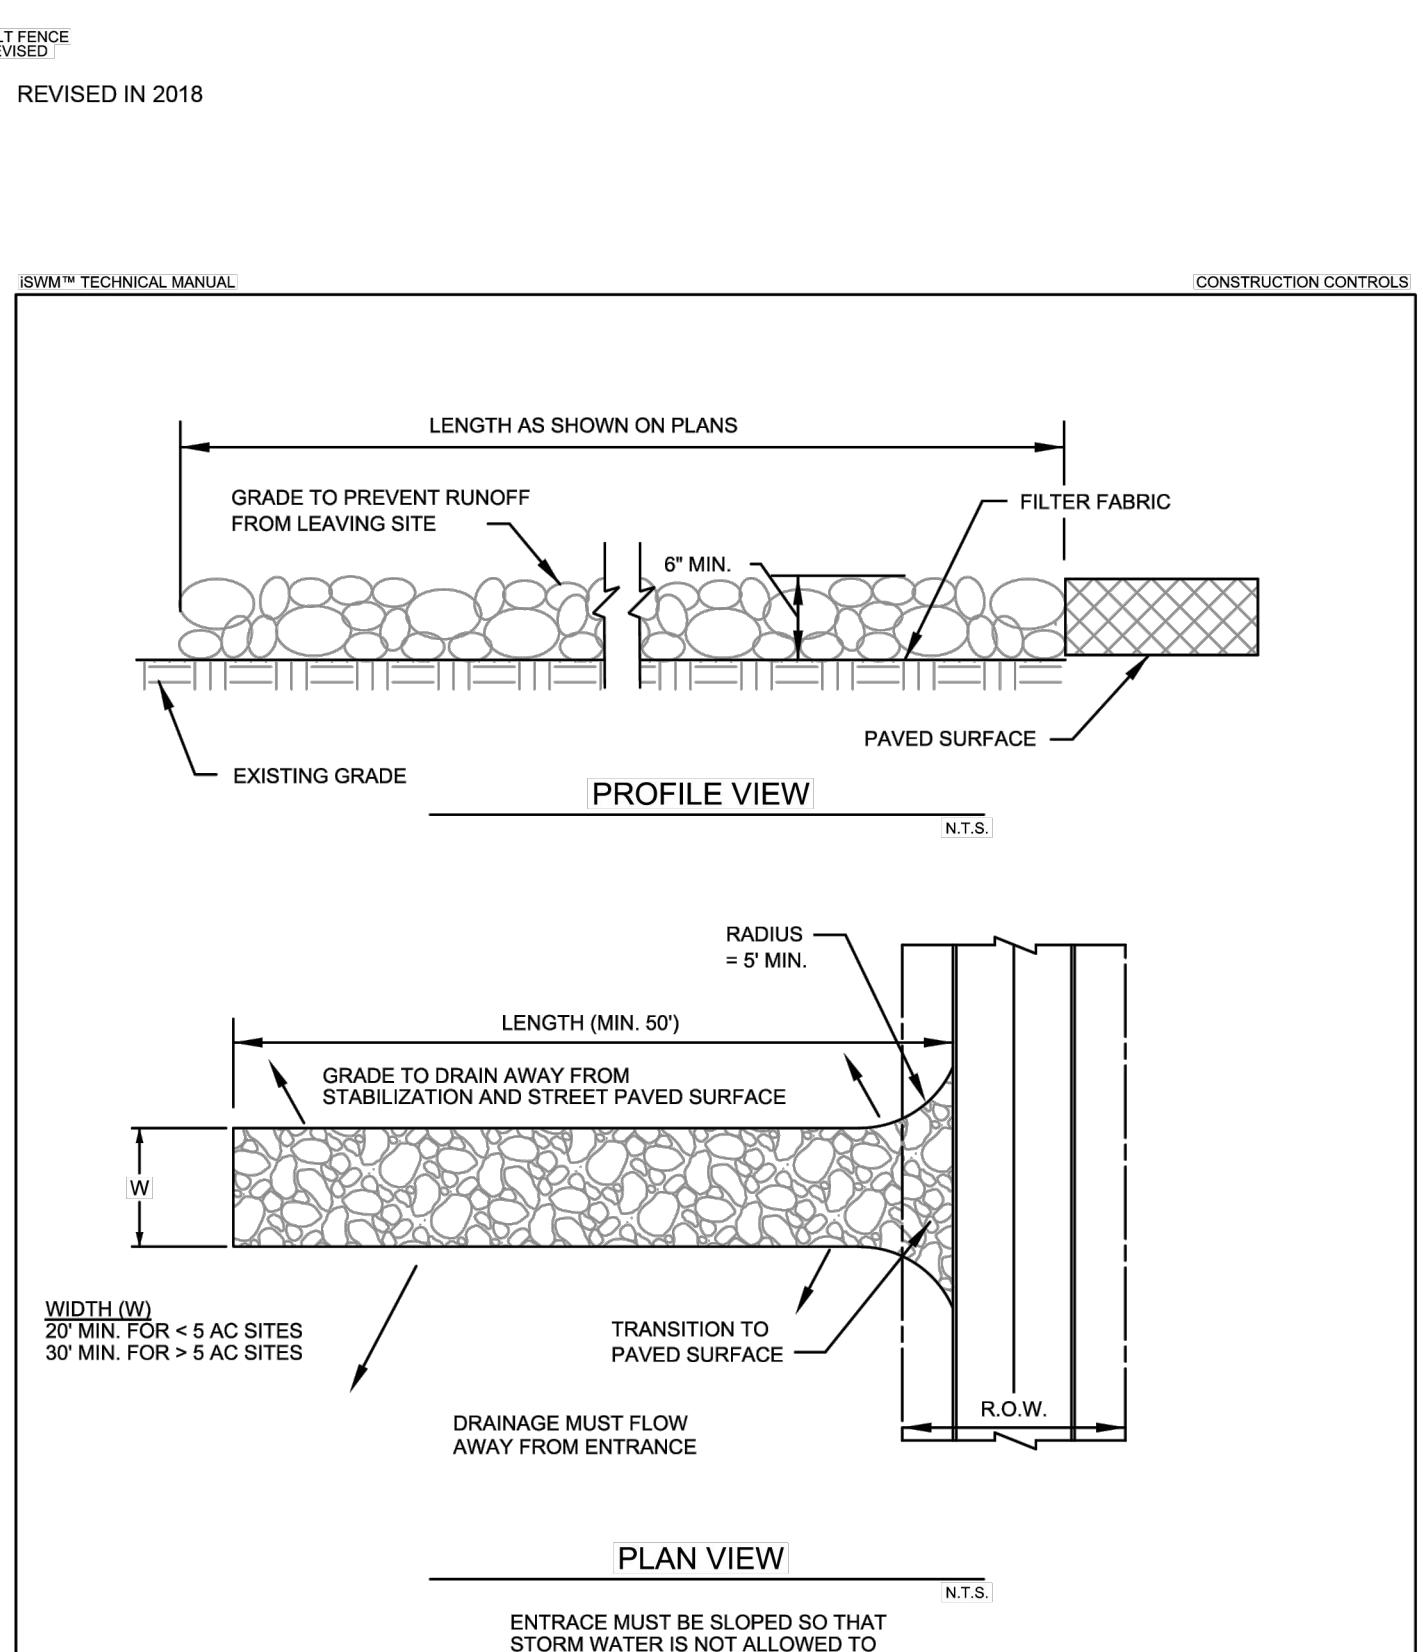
STANDARD CONSTRUCTION DETAIL - STABILIZED CONSTRUCTION EXIT (1 OF 2)
